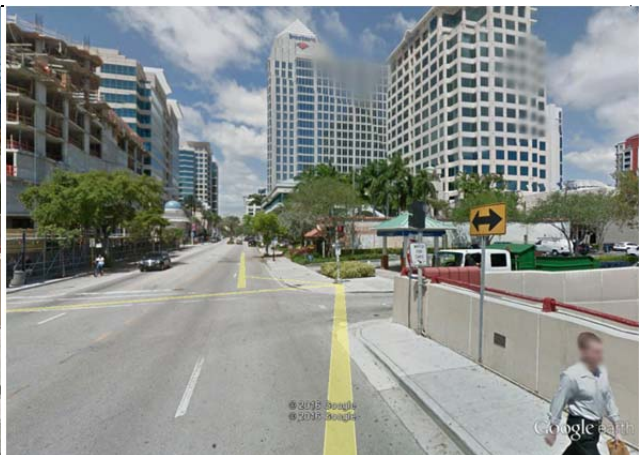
Tunnel wall, Las Olas Blvd., looking west. Note: substandard sidewalk next to tunnel wall is significantly narrower than other sidewalks along Las Olas Blvd.
